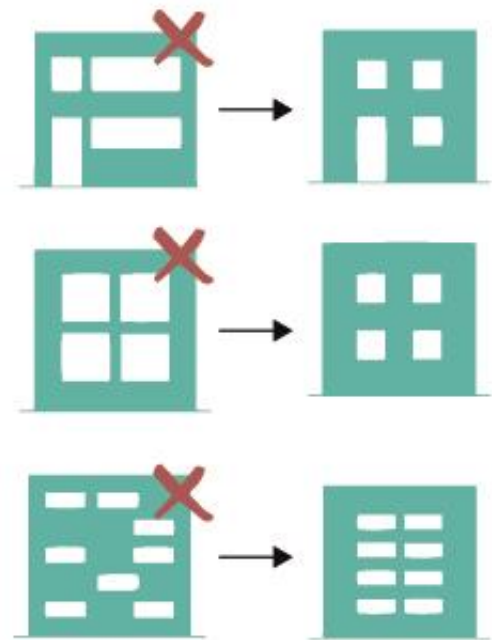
Limit the wall openings in diaphragms (Adapted from Arup, 2014).
